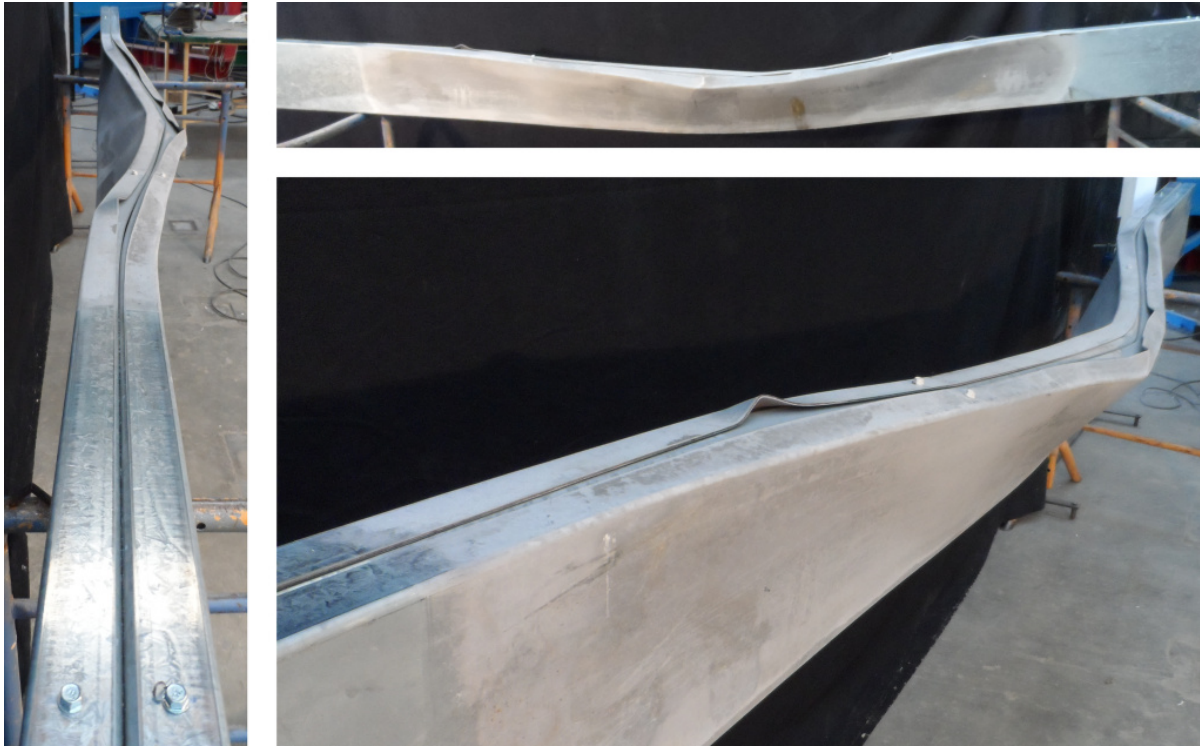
Failure modes of the test beam B_ka+kr-2R_2 under fire conditions
